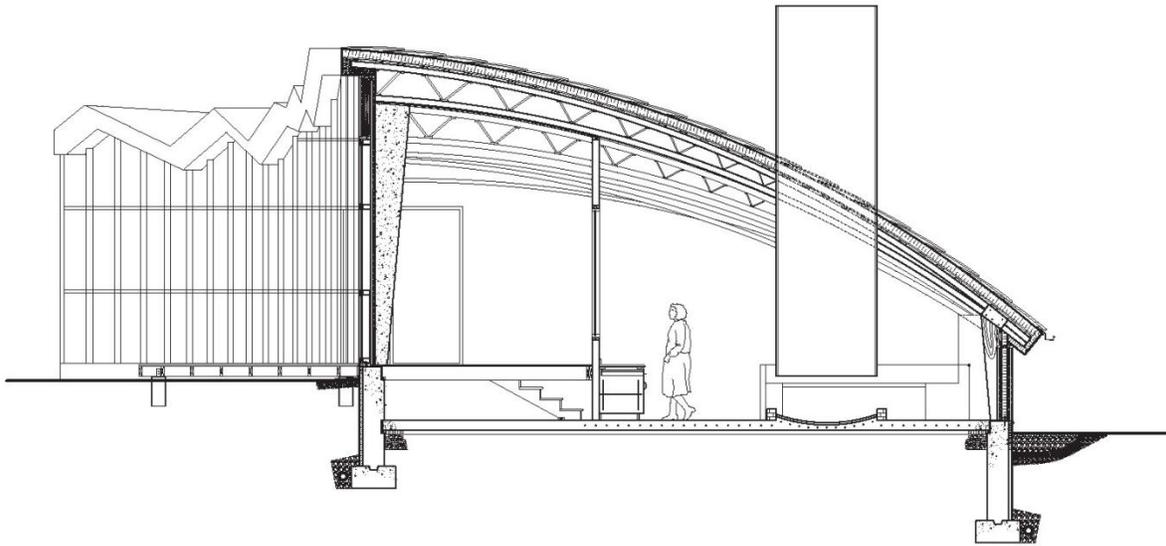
Short section through house – vestibule/sunroom and seating area around hearth
